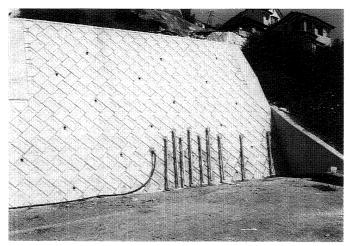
Location of drainage pipes (Photo Nov. 10, 1997).
